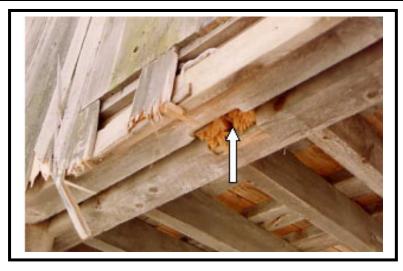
4-62: Failing Bottom Chord/Vertical Connection
